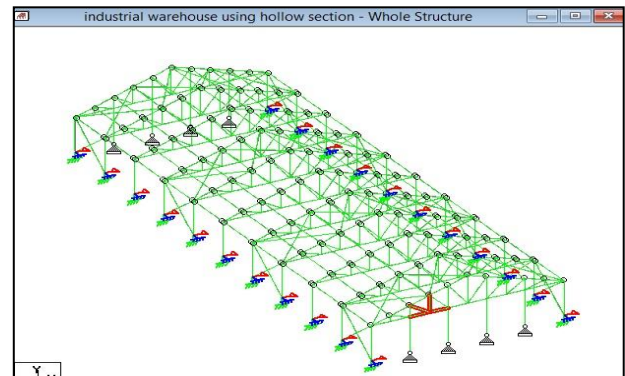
Location where N-type of joint is designed for welded connection
